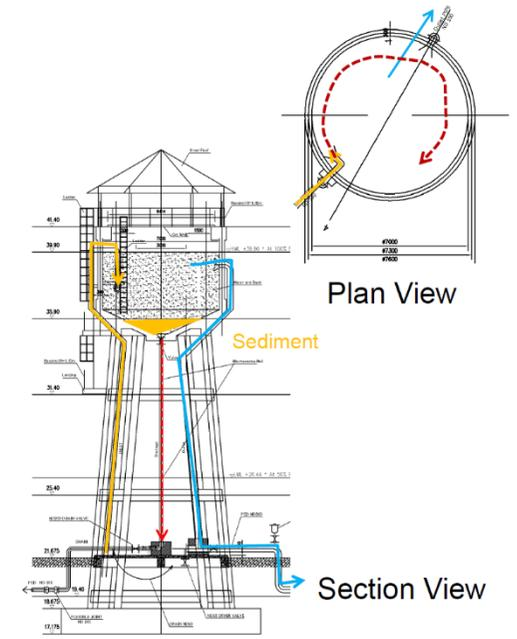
Drainage Route of Side Wall Water Conveyance Type Sand Basin (Swirl 1tank)
